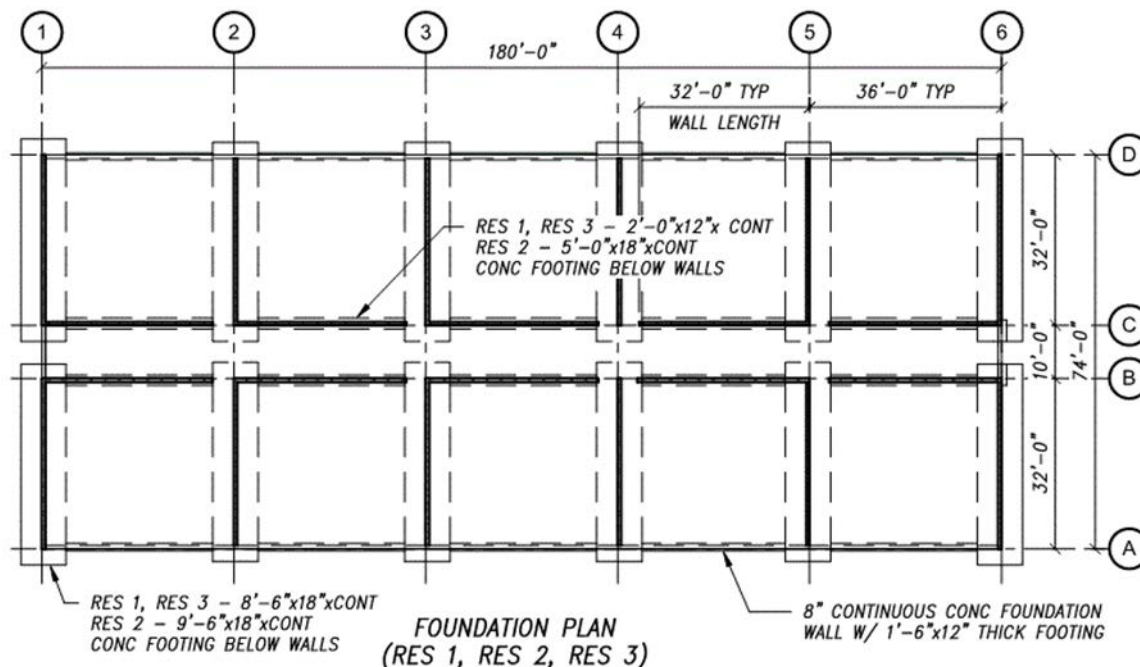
Four-story residential building foundation configuration: RES1, RES2, RES3.
